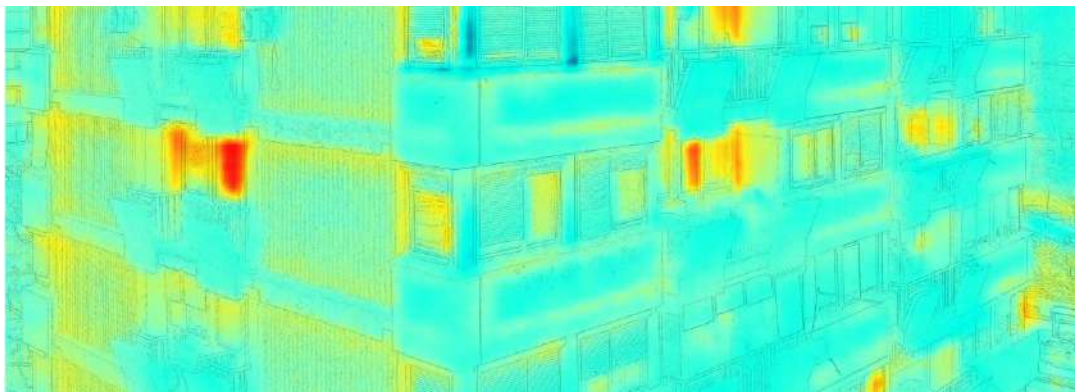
A thermographic drone photograph of the façade: noticeable heat losses through the reinforced concrete walls, particularly in the areas of edge beams and columns, in the inter-floor structure zone, at parapets connecting the load-bearing and exterior concrete layers, and in the areas around the original windows
